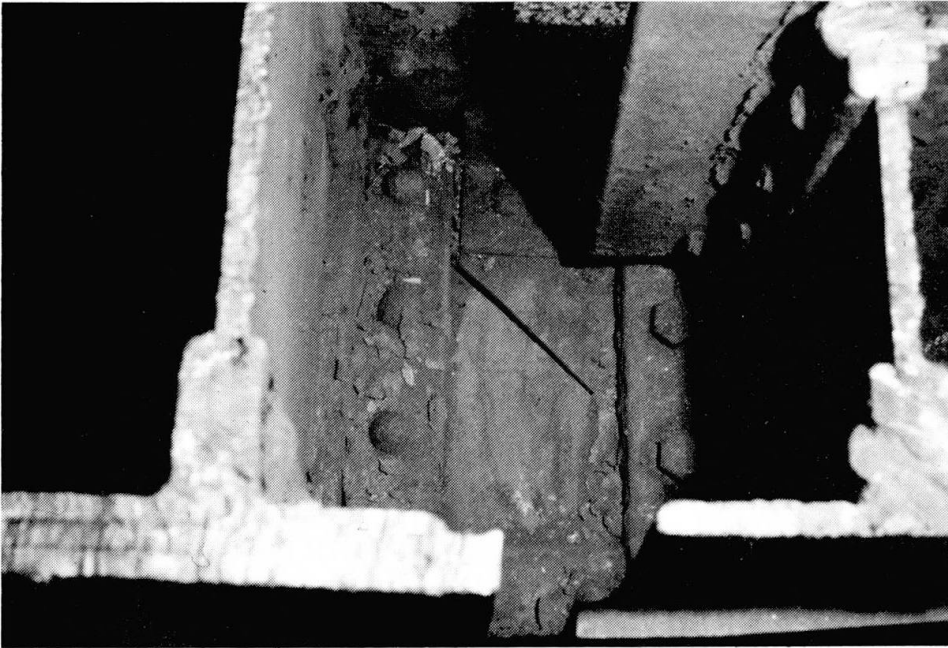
Connection between transverse girder and main girder, crack in web plate
